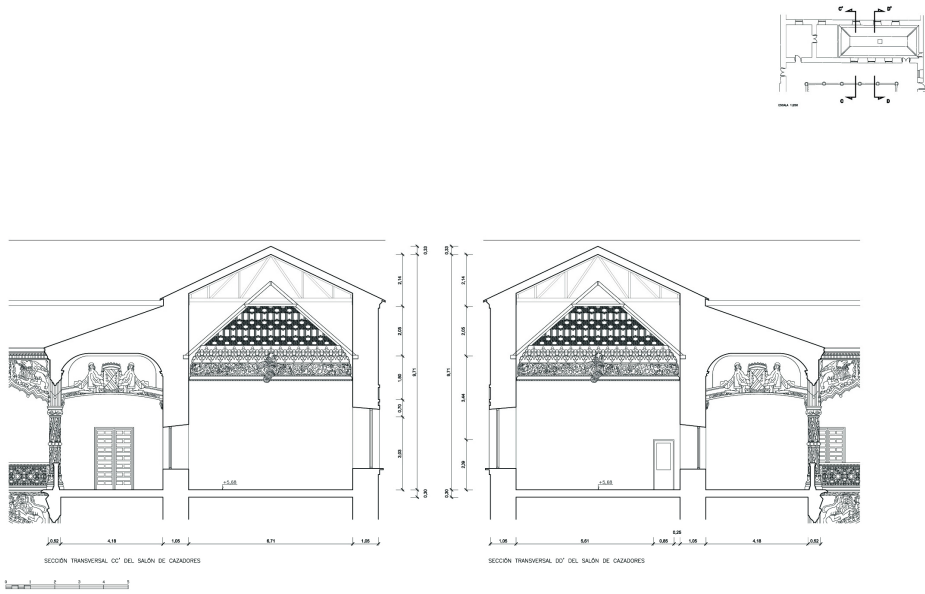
Panelwork proposed reconstruction. Transverse sections.
